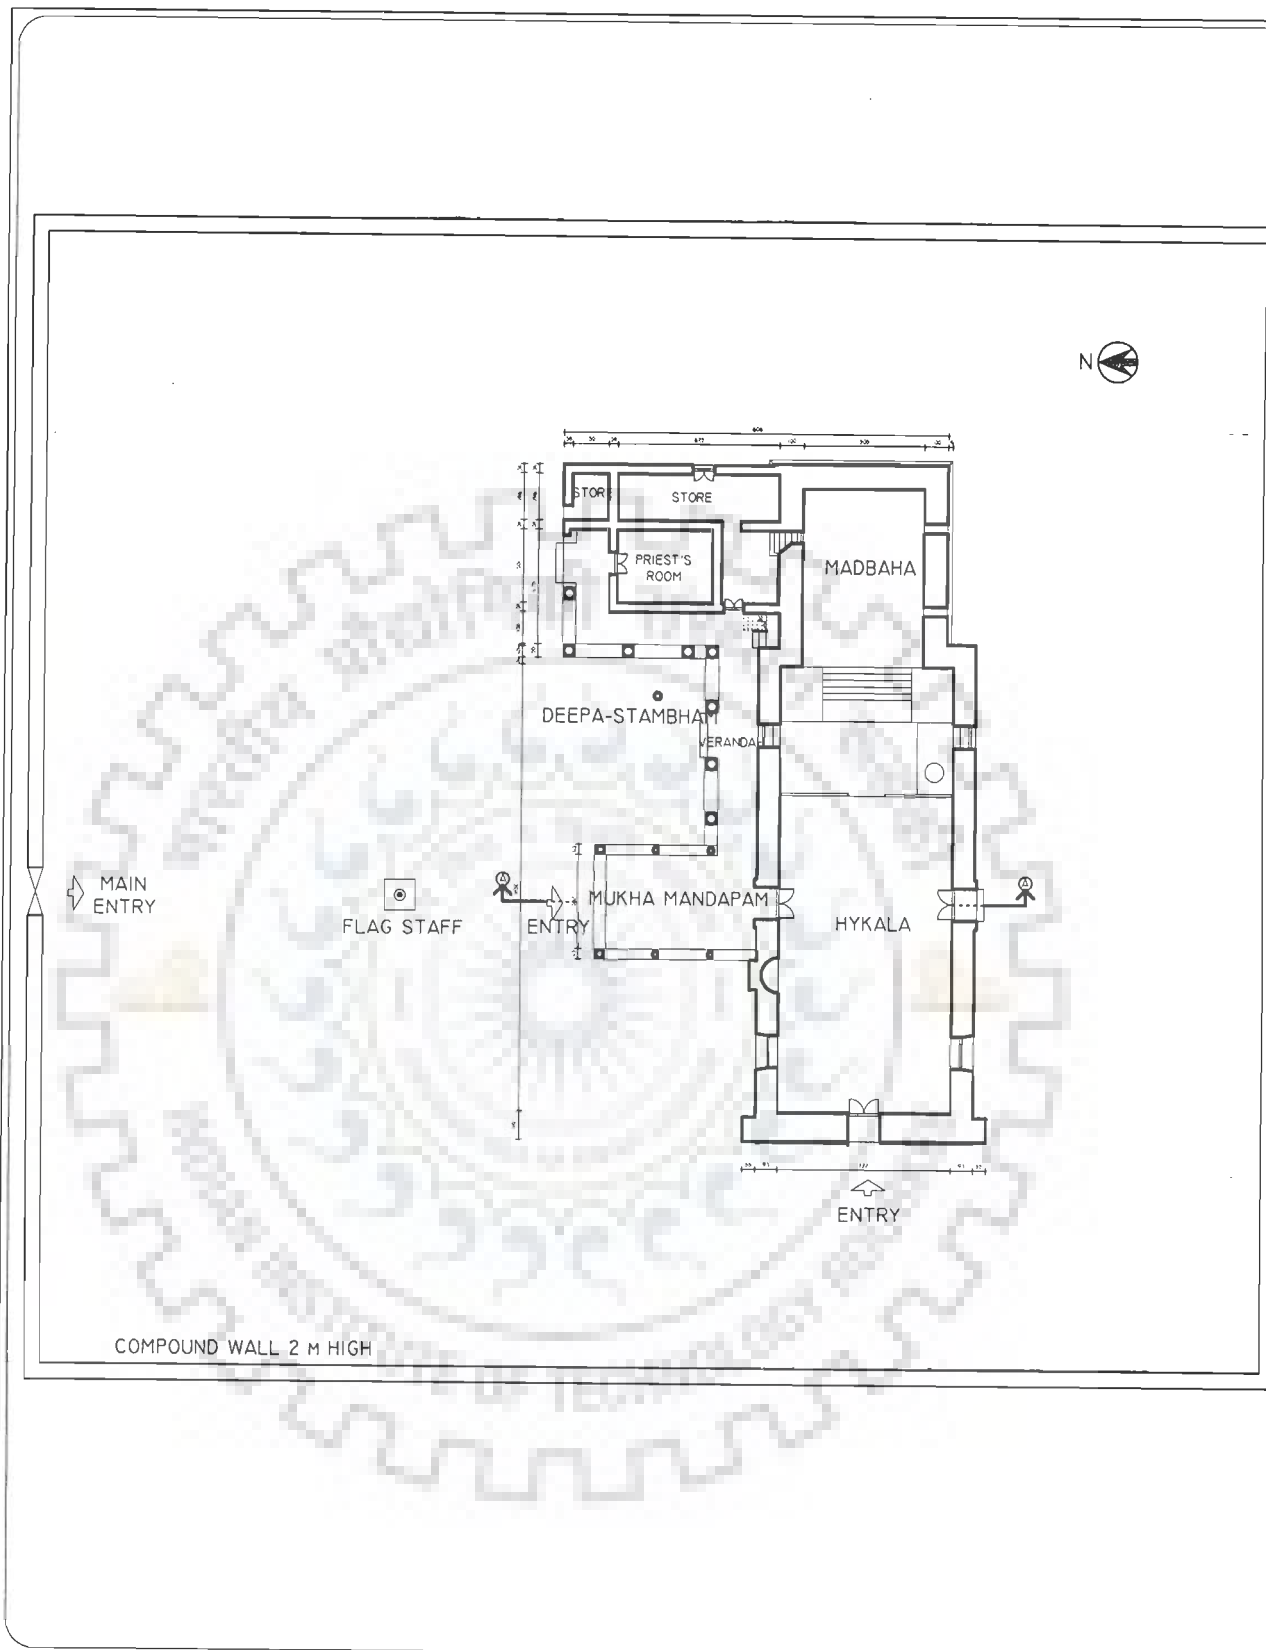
PLAN, (WITH SITE PLAN) KALLOPPAARA CHURCH
